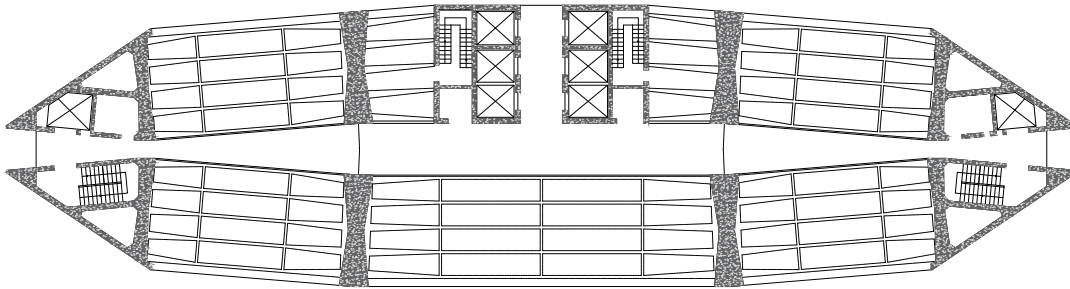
Plan view of a generic storey. From Drawing 1.
